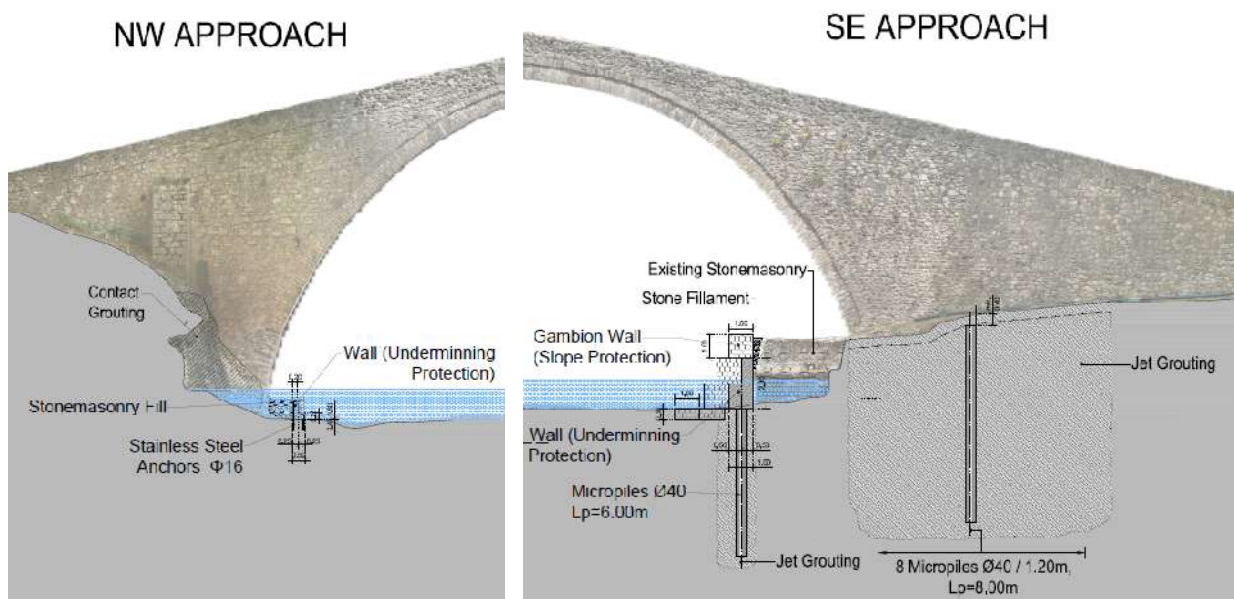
Upstream view of the proposed geotechnical measures. Left: at the northeast abutment. Right: at the southwest of the Pyli Bridge.
